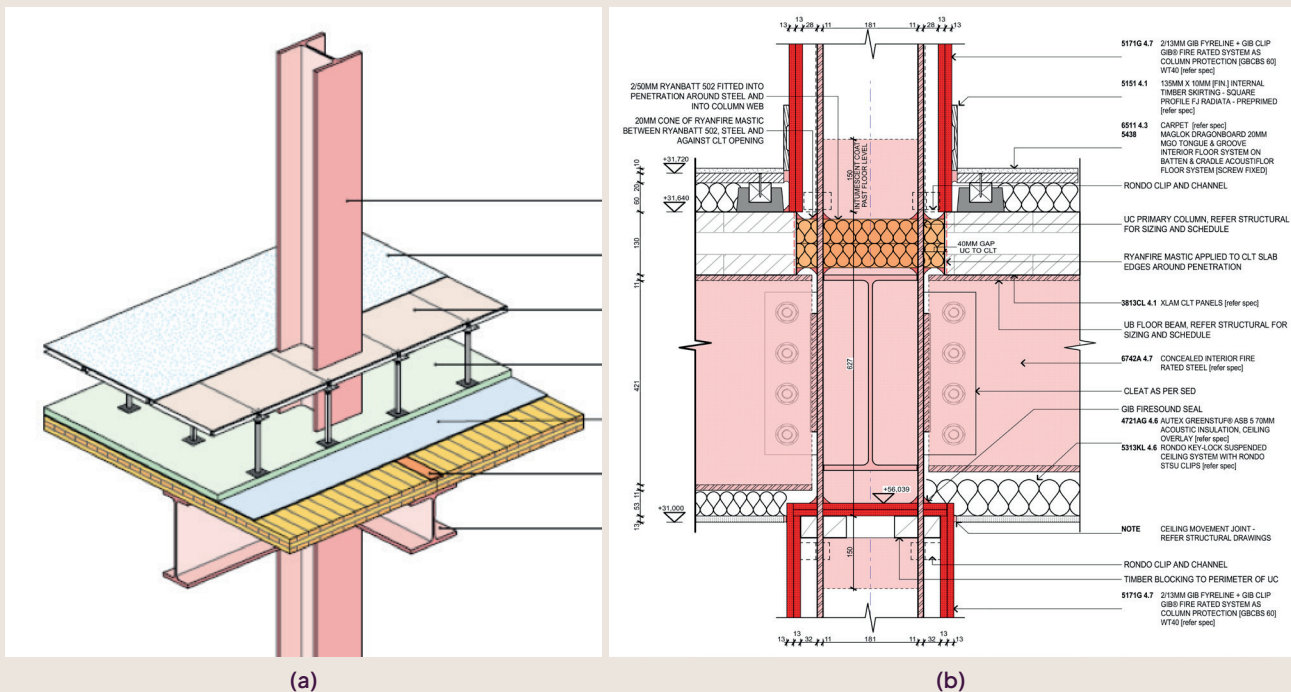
Design considerations for fire stopping of a complex construction junction; (a) junction comprising a through-floor steel column, steel beams and CLT floor panels (AISC, 2022) (b) generic design solution involving different fire stopping products and passive fire protection systems
